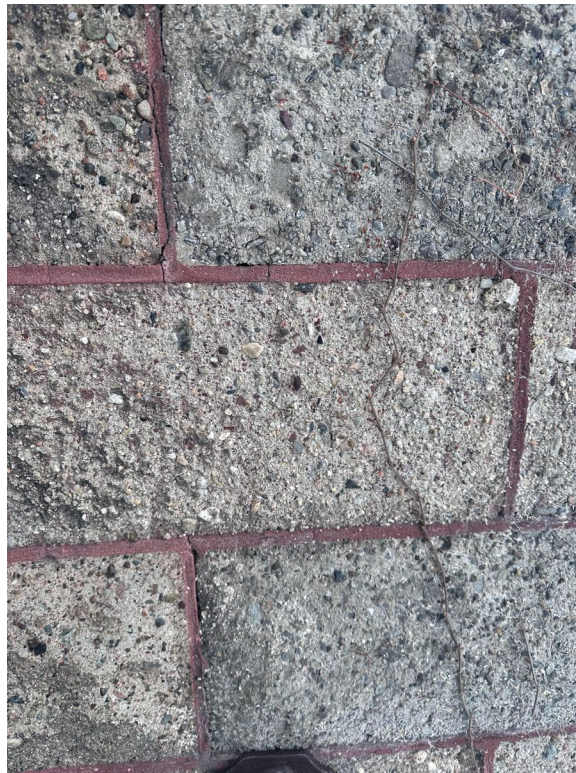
Concrete Block construction on 1735 Henry Street (February 16, 2024)
